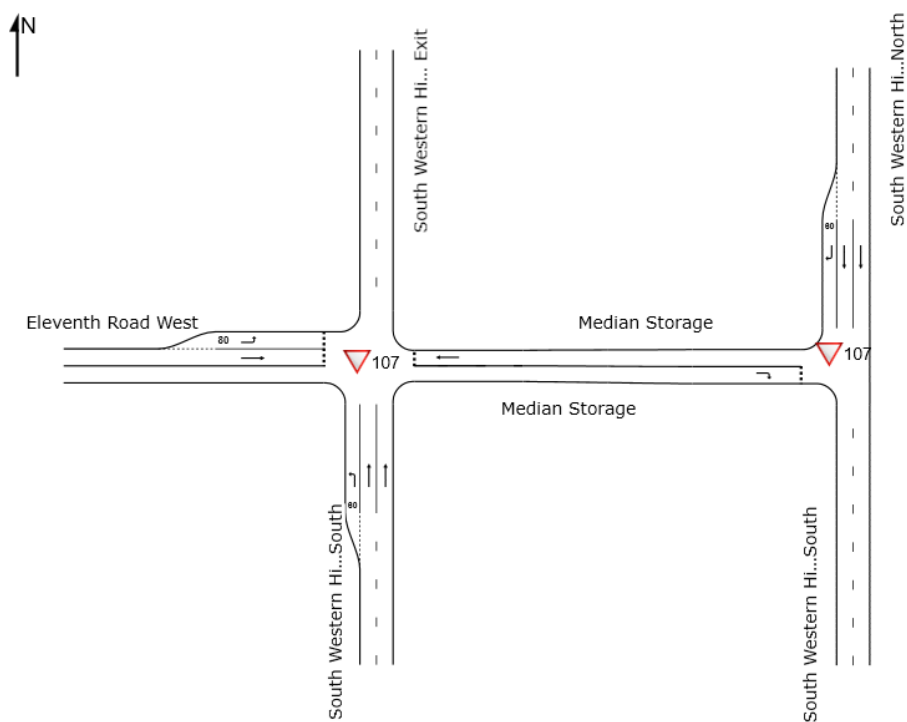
SWH/ Eleventh Road – two staged intersection layout – with SWH duplication
